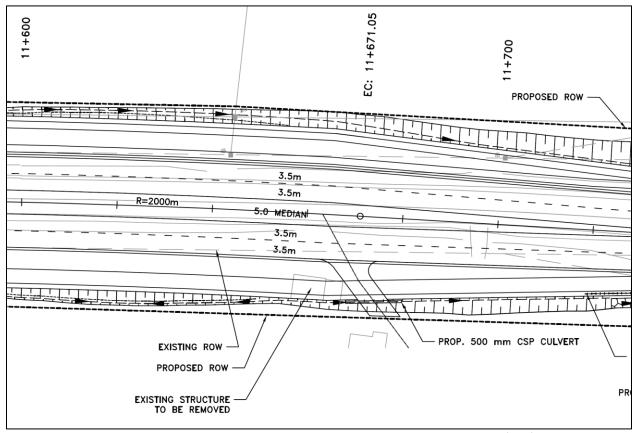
Proposed road widening showing the existing garage structure to be removed (HDR)
